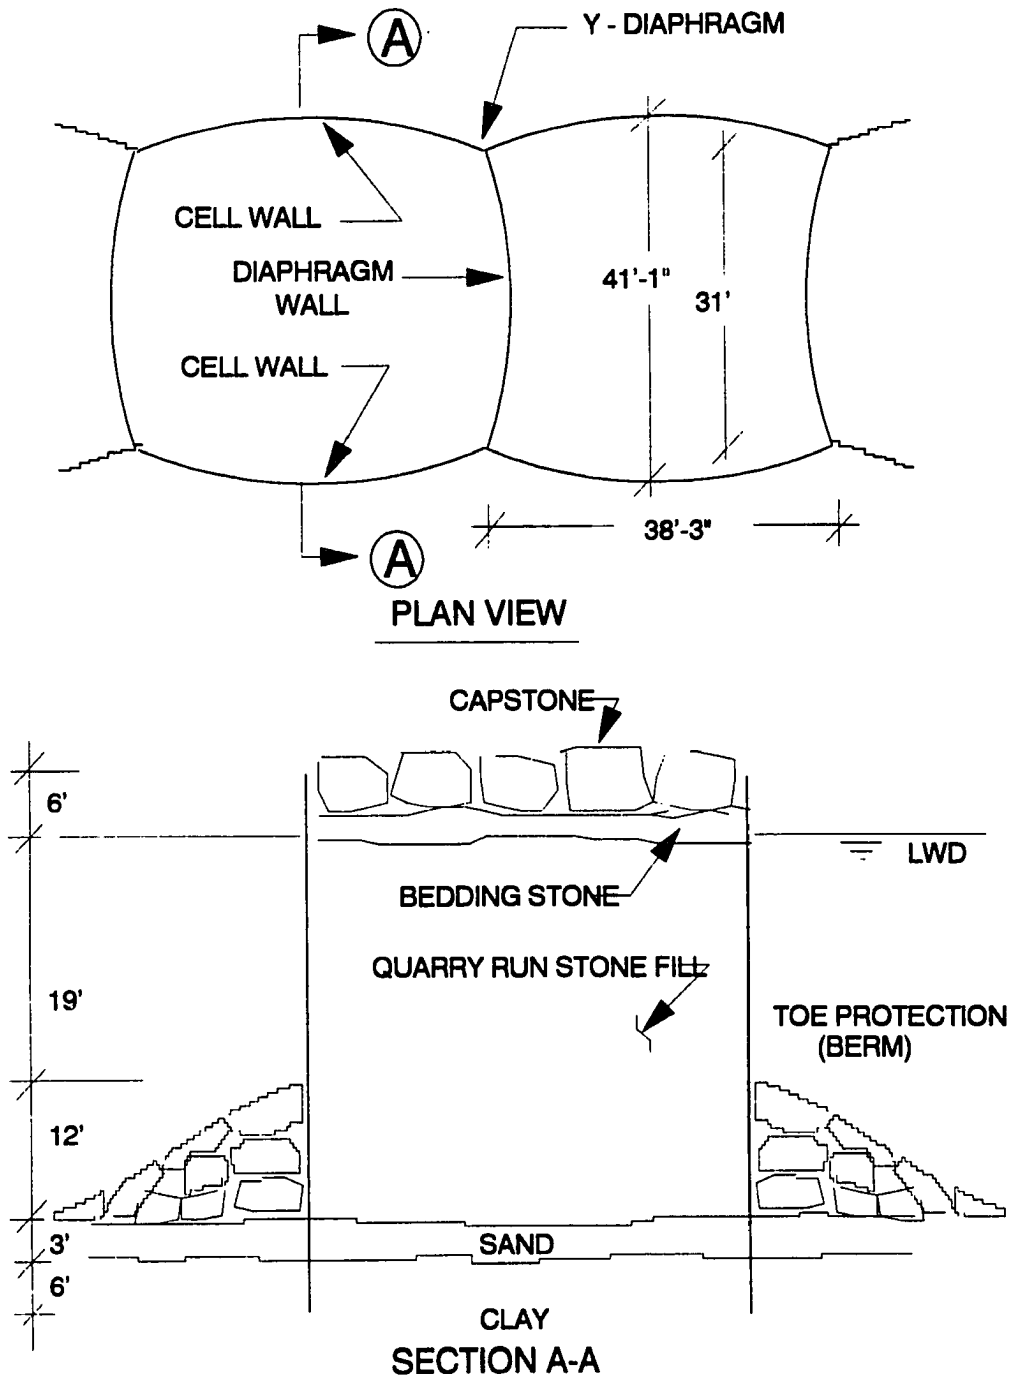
Sectional elevation and plan view of breakwater cells.
